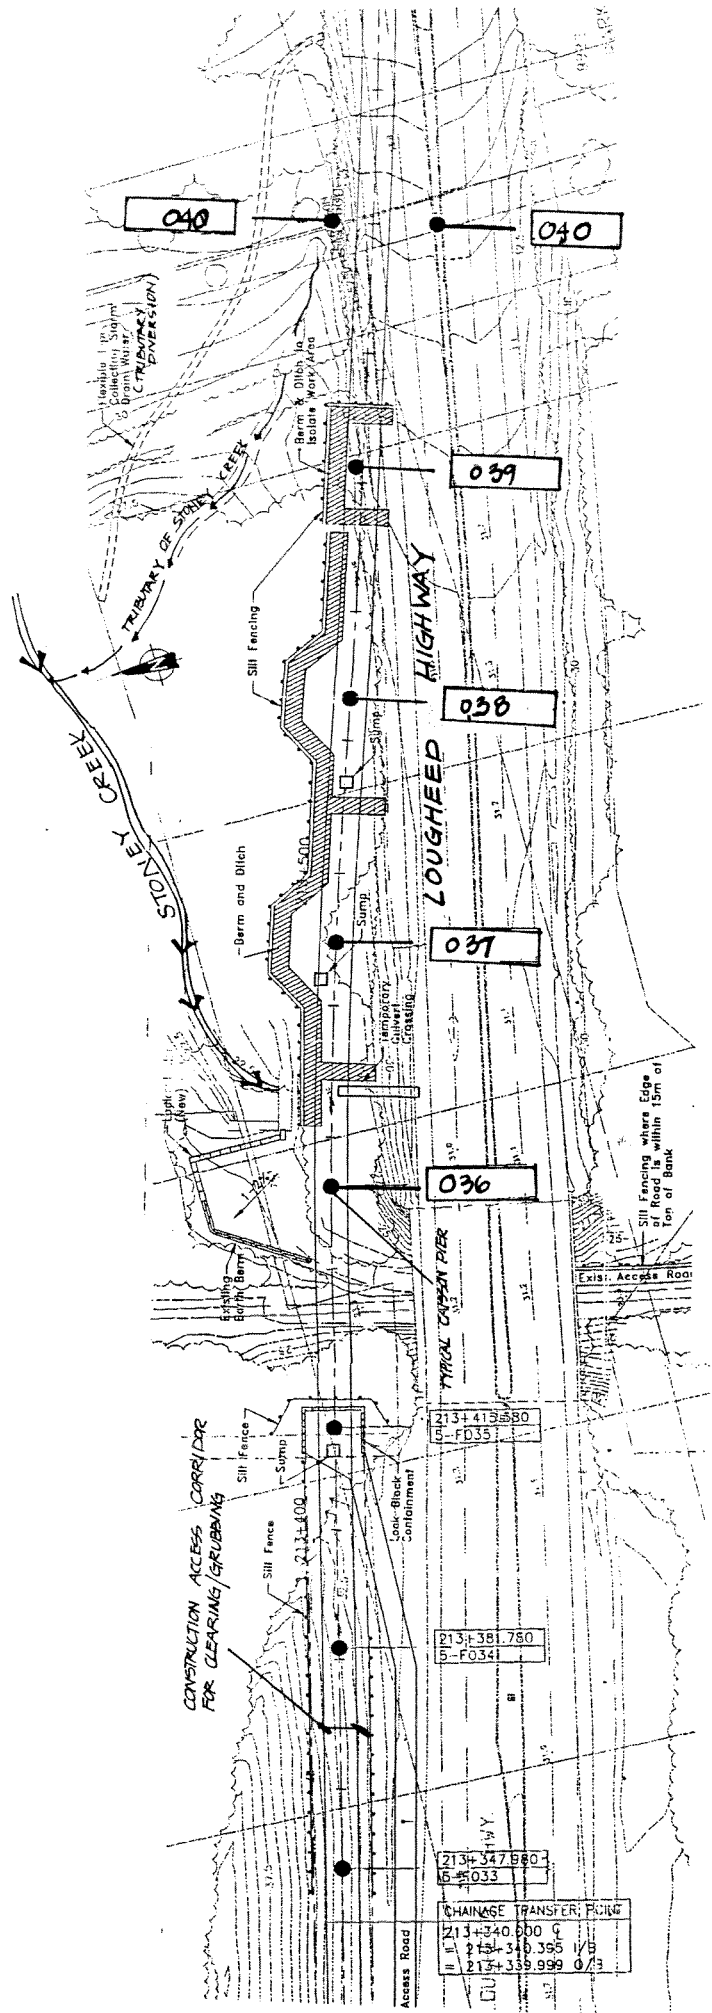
Proposed Skytrain Guideway Development and Sediment Control Plan for the Stoney Creek Crossing
